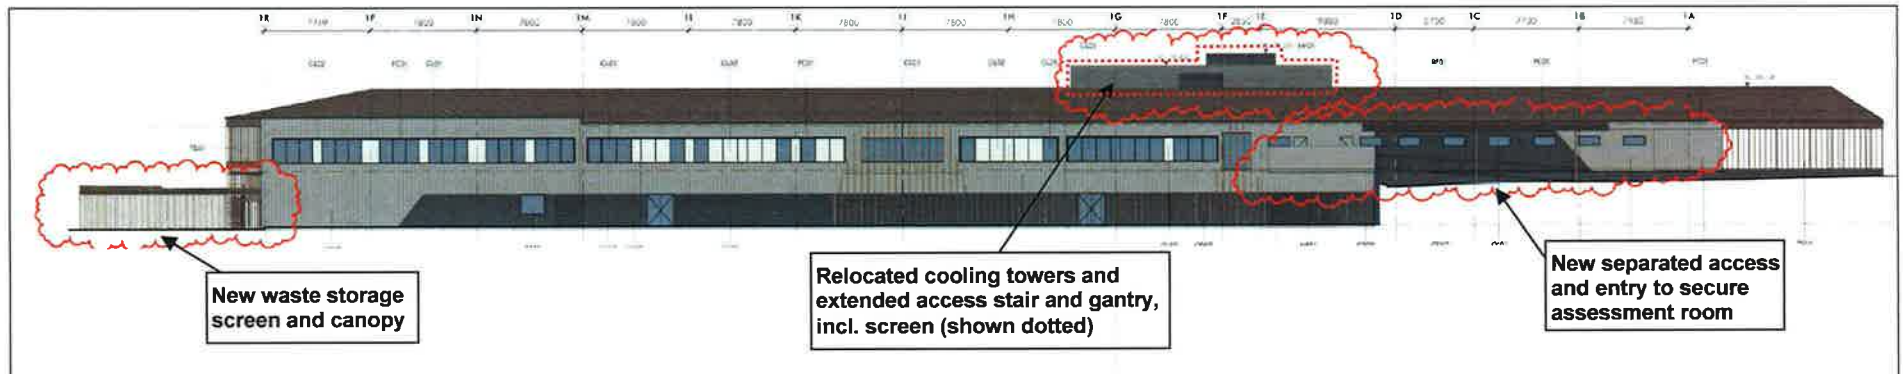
Proposed Ewingsdale Road (Northern) Elevation (changes outlined in red)
